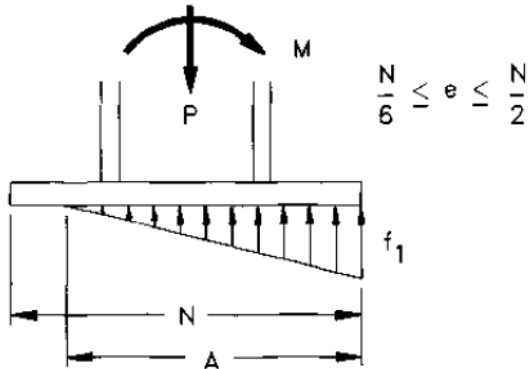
Moderate Eccentricity - Bearing on Partial Plate
